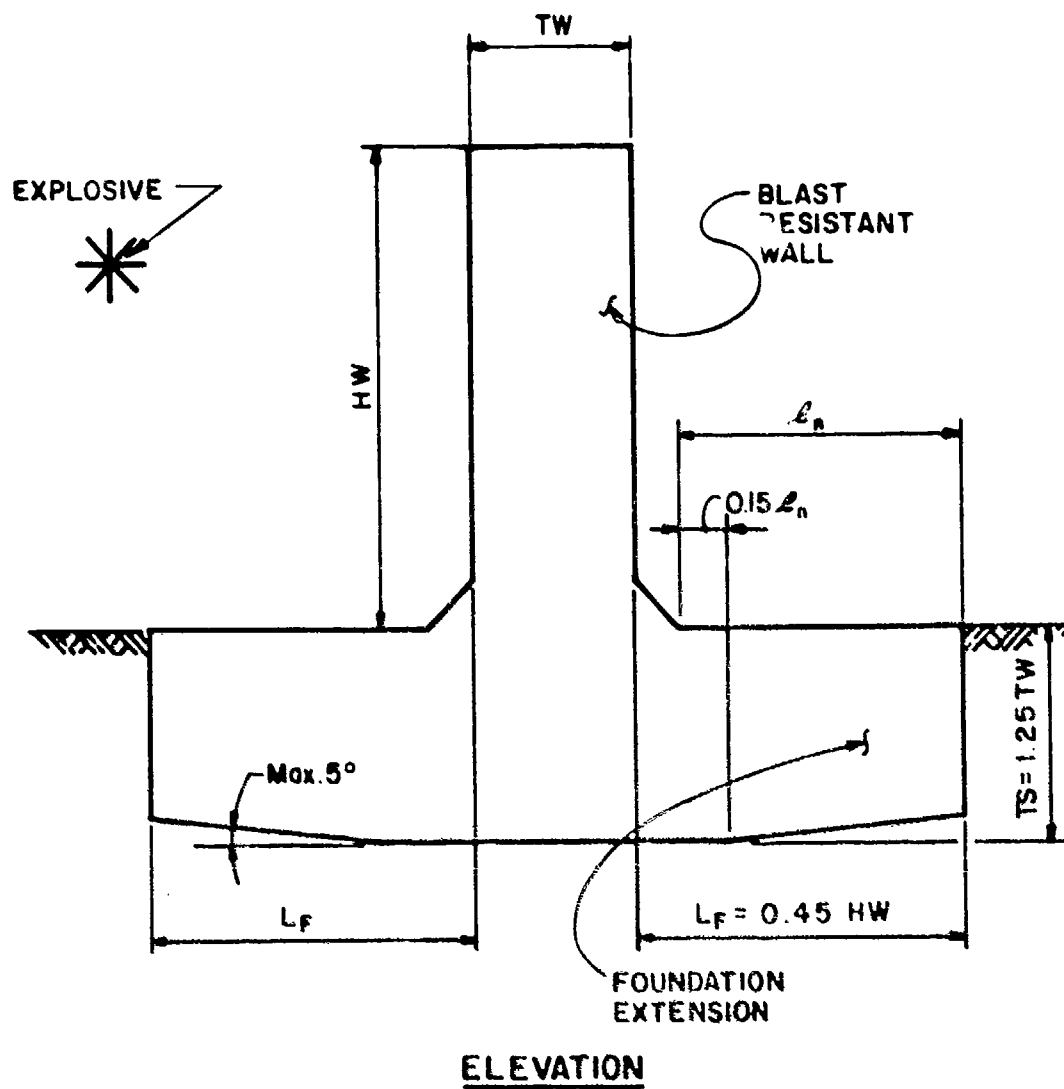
Cantilever wall barrier - Estimated foundation dimensions.
